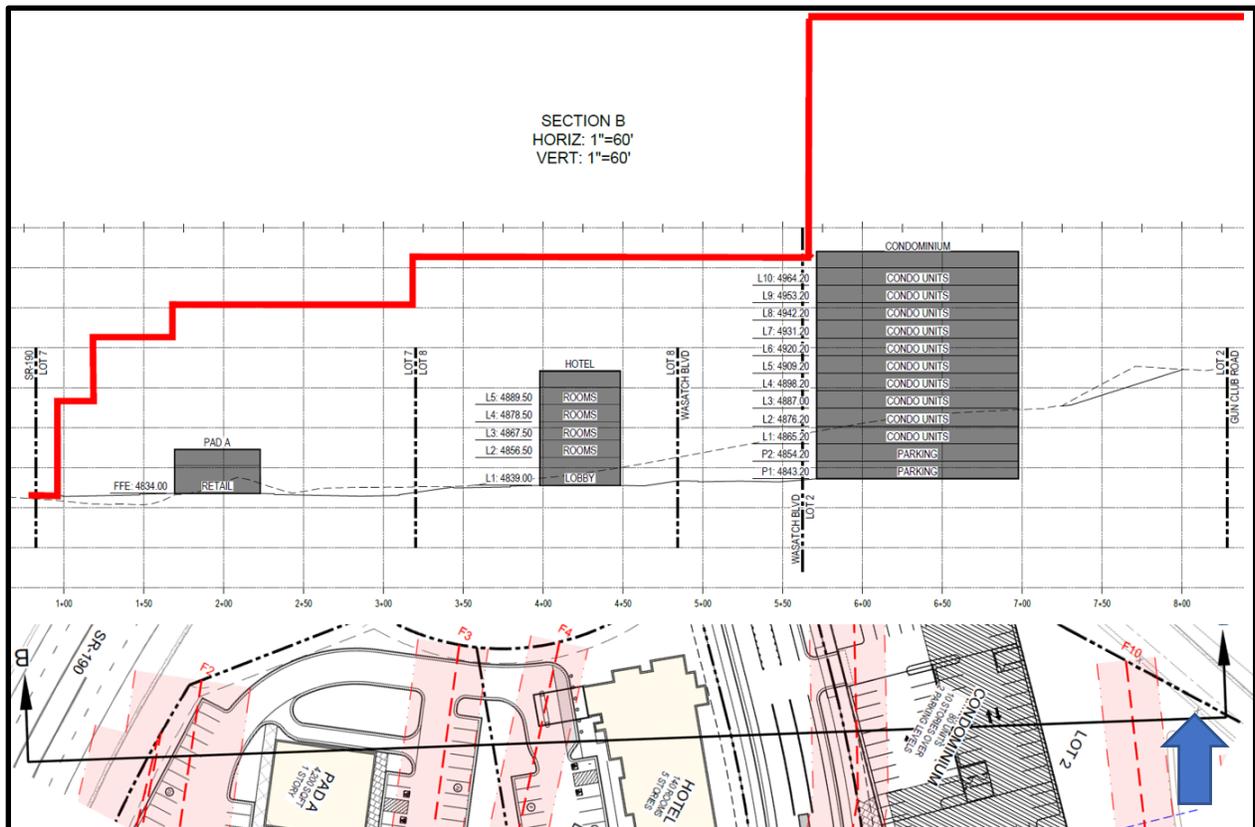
NORTH BUILDINGS - HEIGHT CROSS SECTION (RED MAXIMUM HEIGHT PERMITTED)
